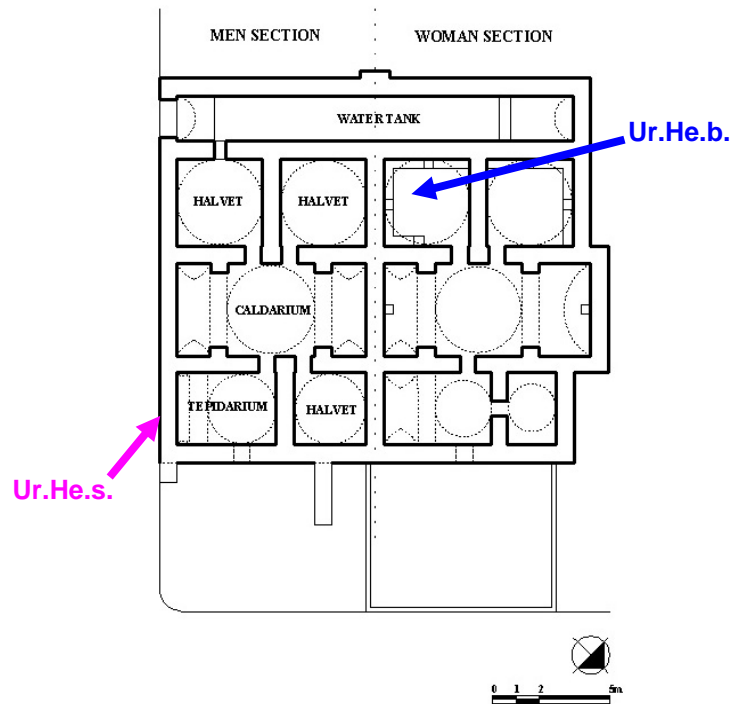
Plan of the Hersekzade Bath in Urla (Reyhan 2004), showing where stone masonry mortar samples (Ur.He.s.) and brick masonry mortar samples (Ur.He.b.) were collected.
